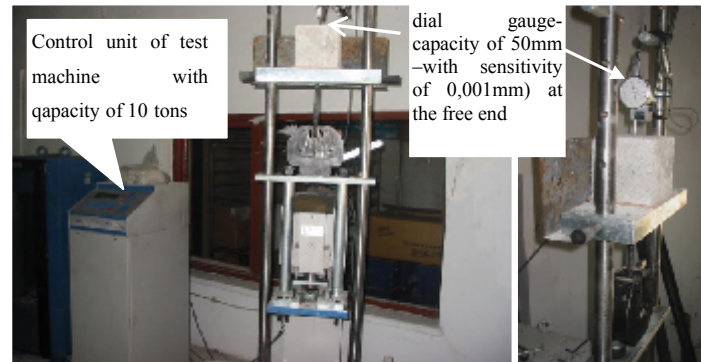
Pull-out test setup used to determine bond strength of R and SLWAC samples
